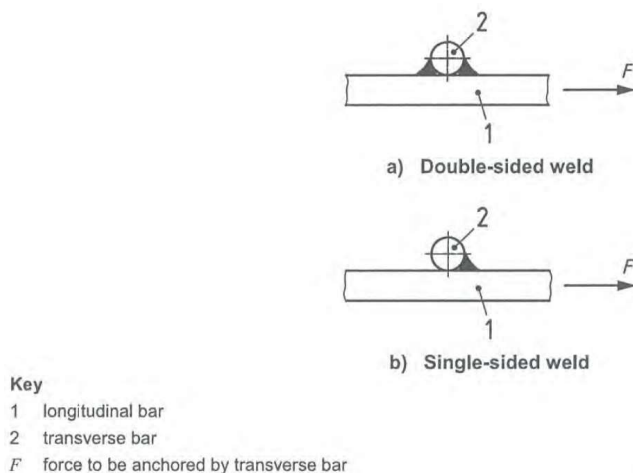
Cross joint welded by welding processes 111, 114, 135 and 136 as per EN ISO 17660. Clause 6.5.2
